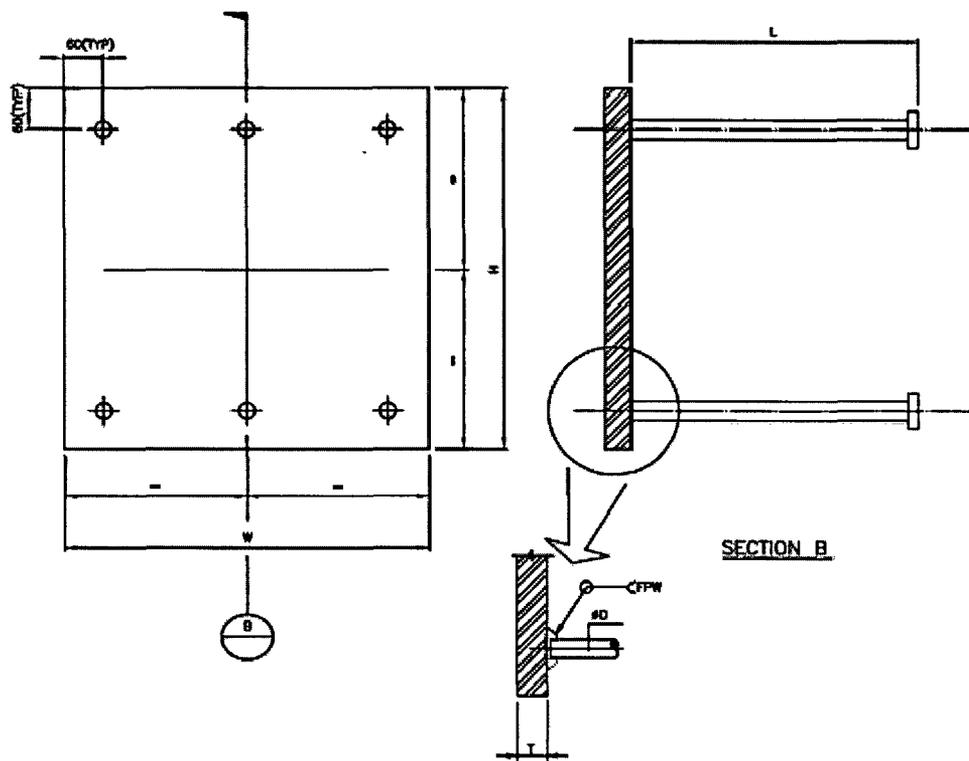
Typical External Containment Plate Support with Embedment
